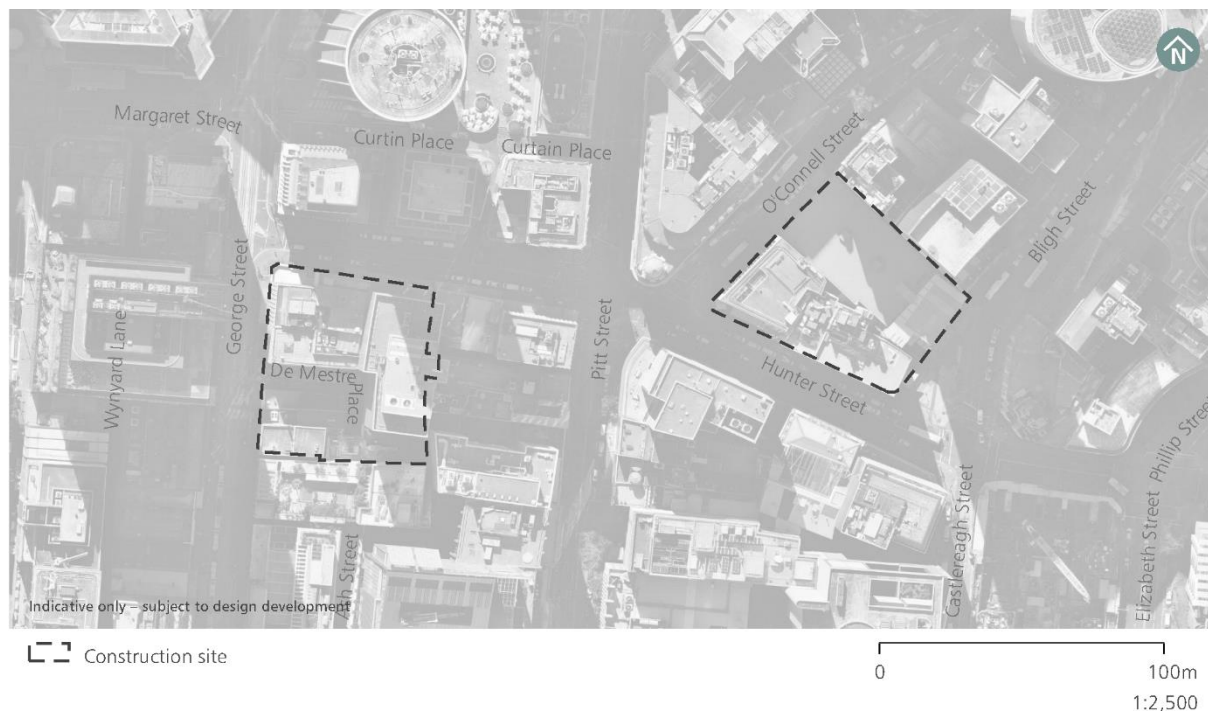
Site plan - Hunter Street Station (Sydney CBD) sites
